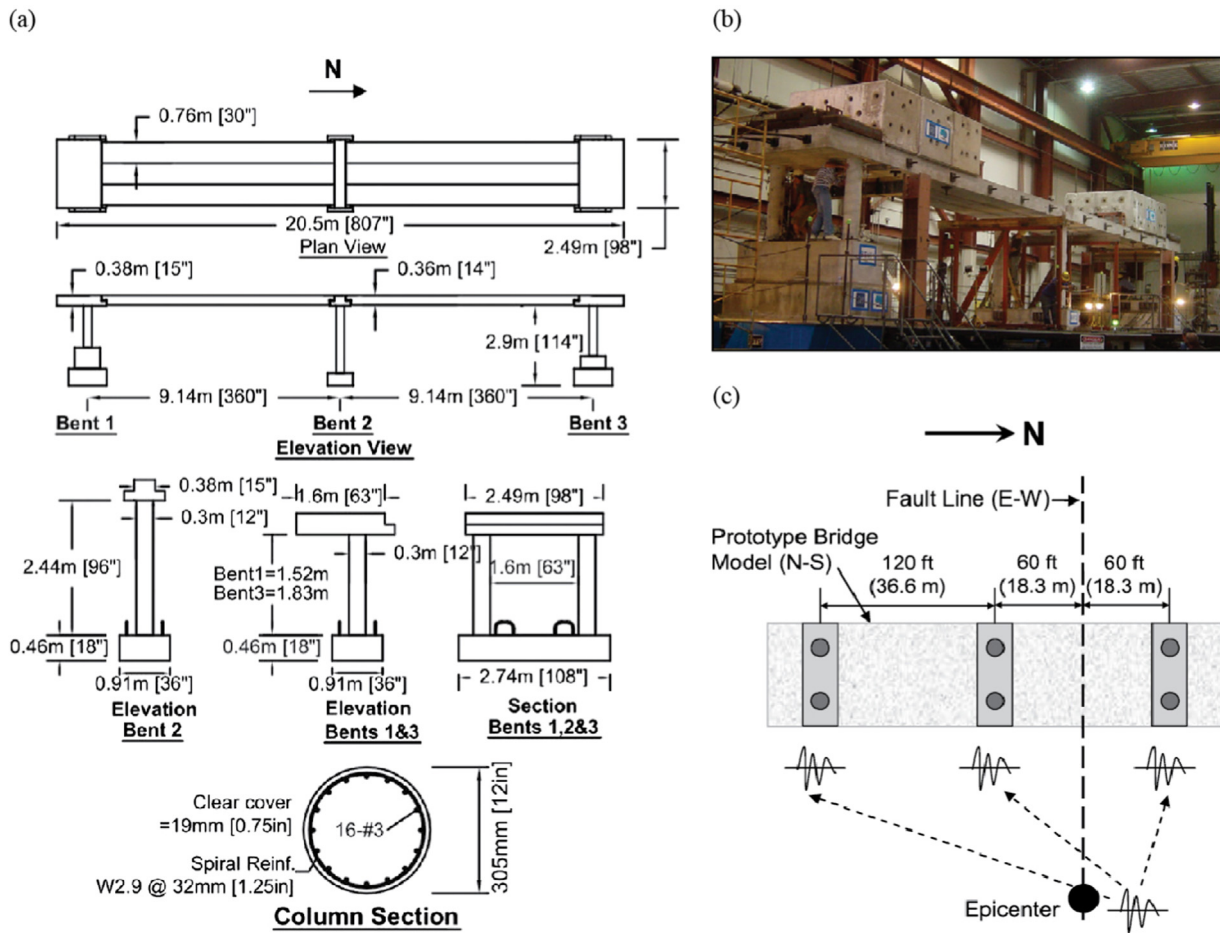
Experiment of a large-scale (1/4) two-span reinforced concrete bridge model subjected to fault rupture: (a) geometry and column reinforcement; (b) shake table setup; (c) bridge and fault locations for ground motion simulation (all figures are reprinted from Saiidi et al. [102]).
